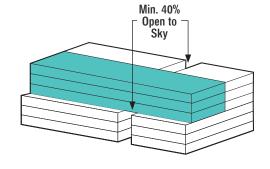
Illustrative Horizontal Building Connectors
